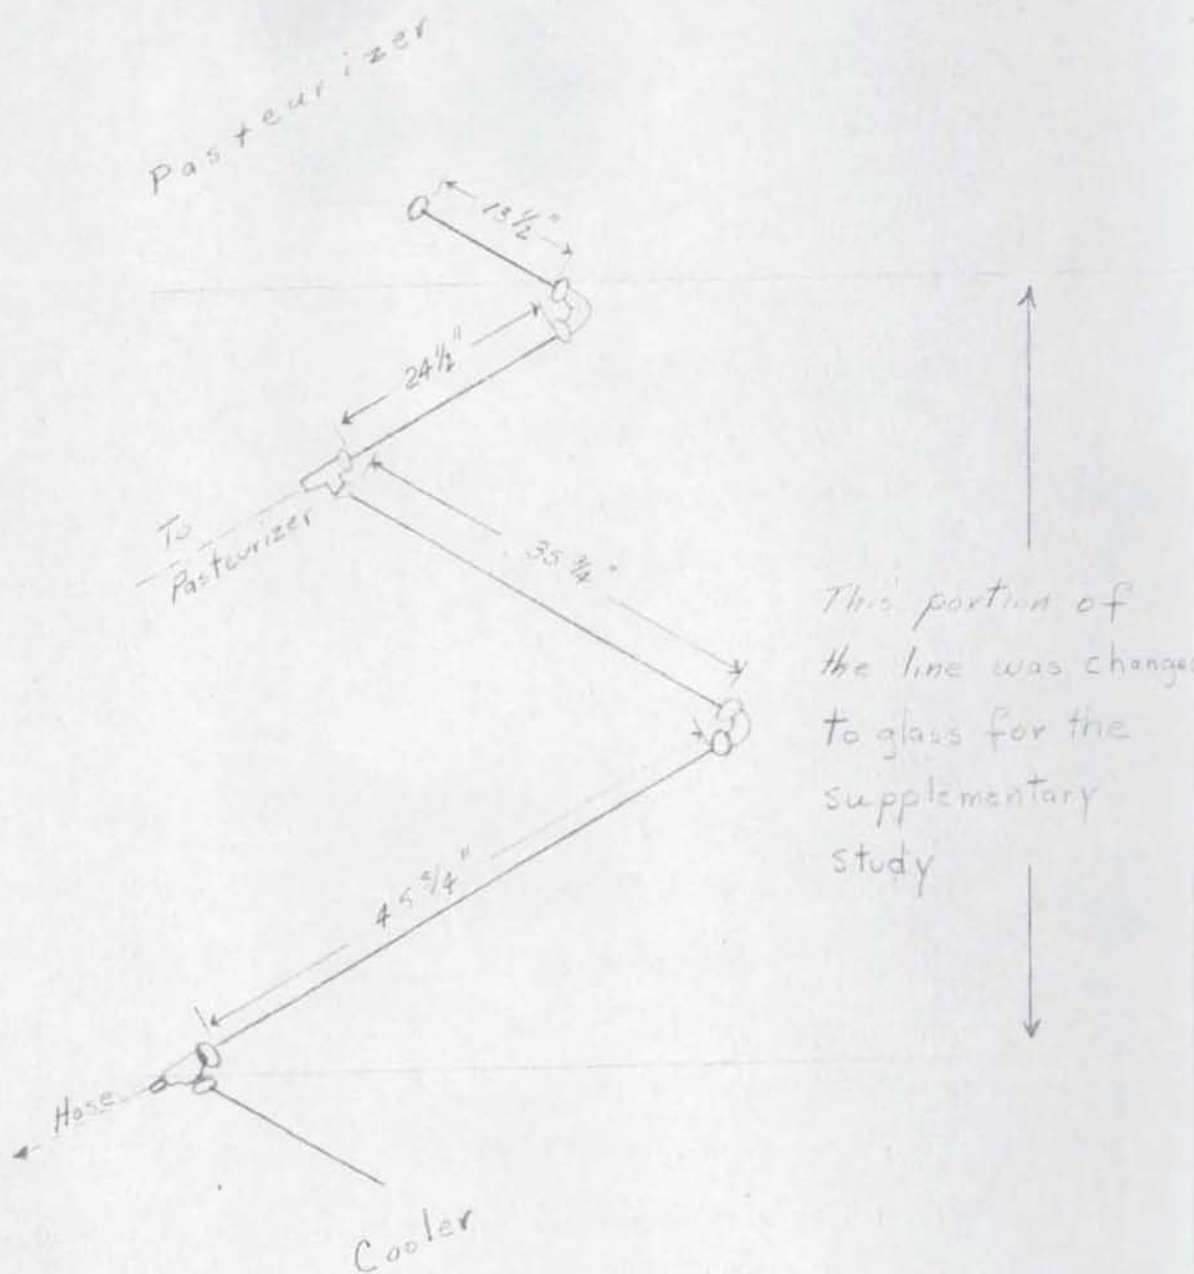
Drawing of the Pasteurized Milk Section of the Experimental Pipe Line
